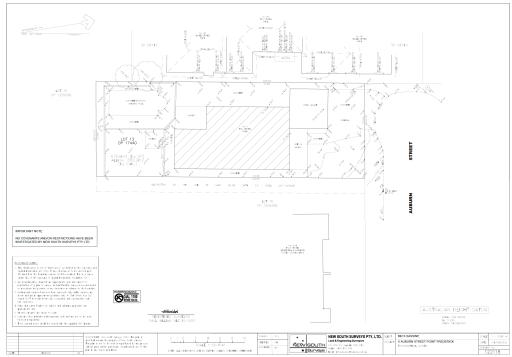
Survey plan (Source: New South Surveys Pty Ltd)
